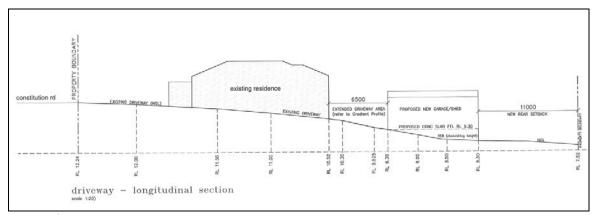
The driveway long section showing the single storey dwelling the proposed garage, storage, laundry and workshop.
